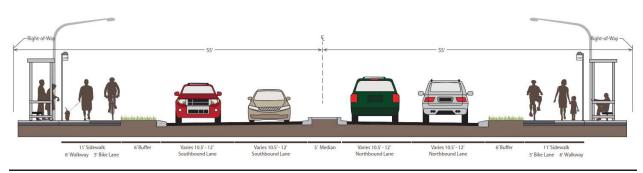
Proposed Typical Section – NE Riddell Road to NE McWilliams Road
